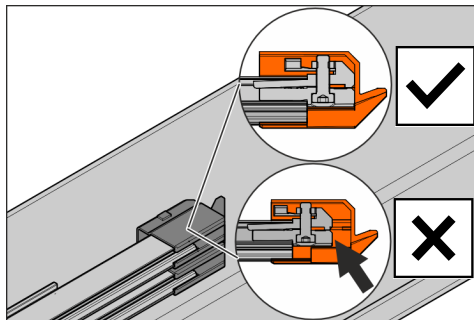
Check the seating of the end caps and check that the power feed terminal and end cap are firmly seated.
